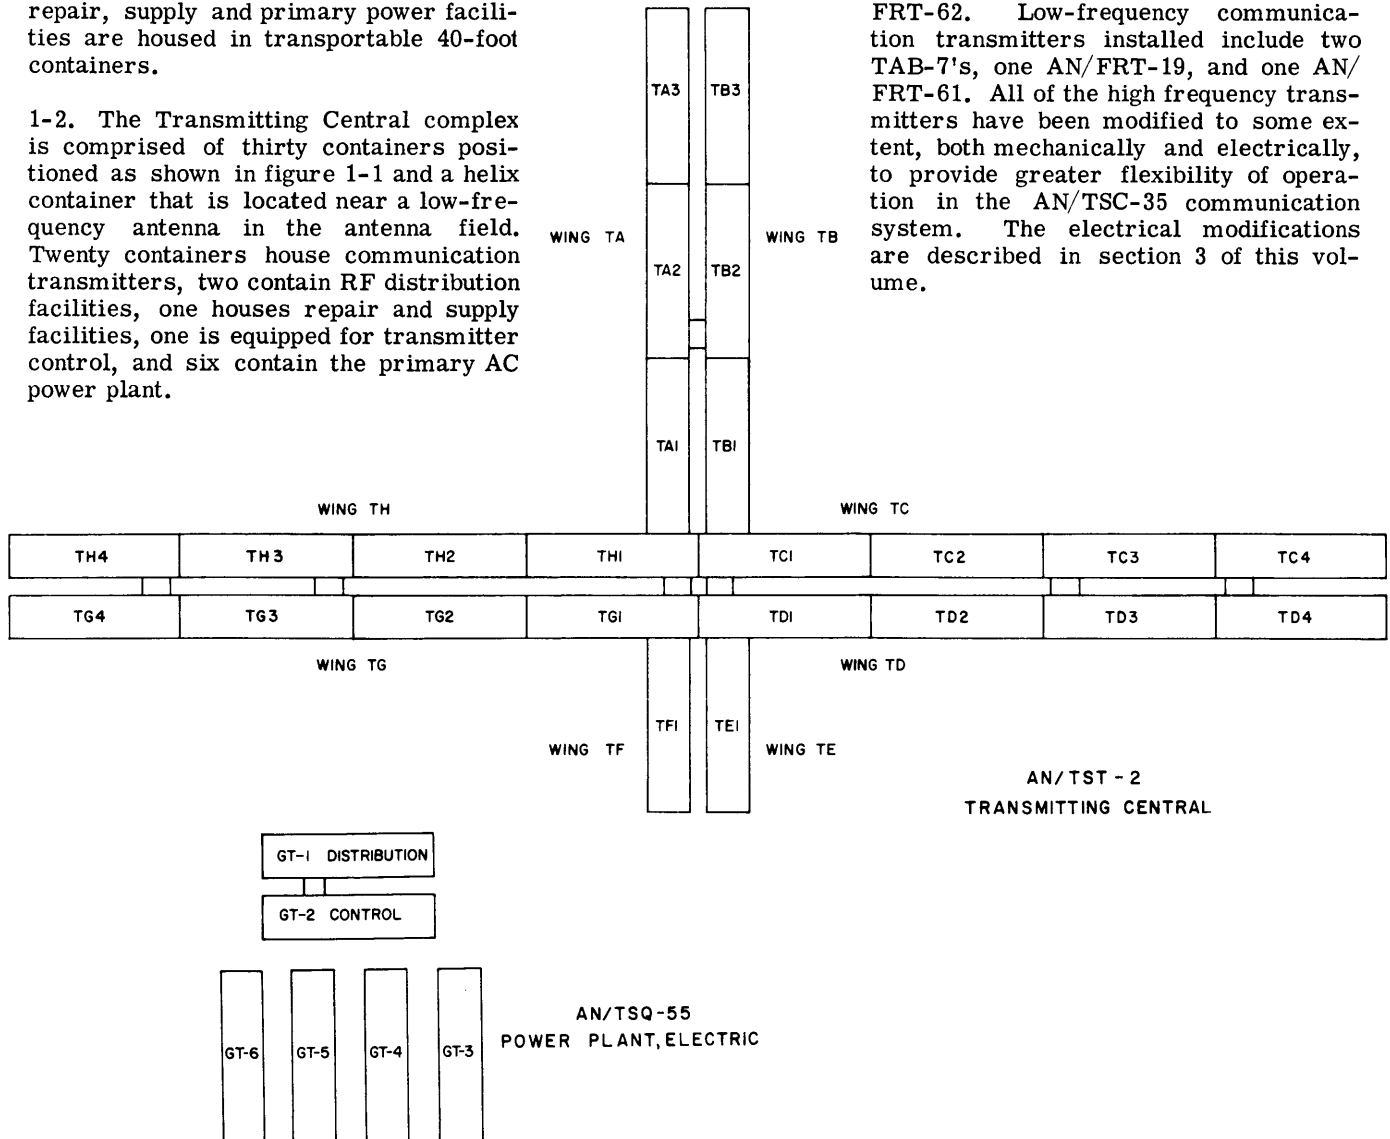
Site Plan, Transmitting Central AN/TST-2 Containers
